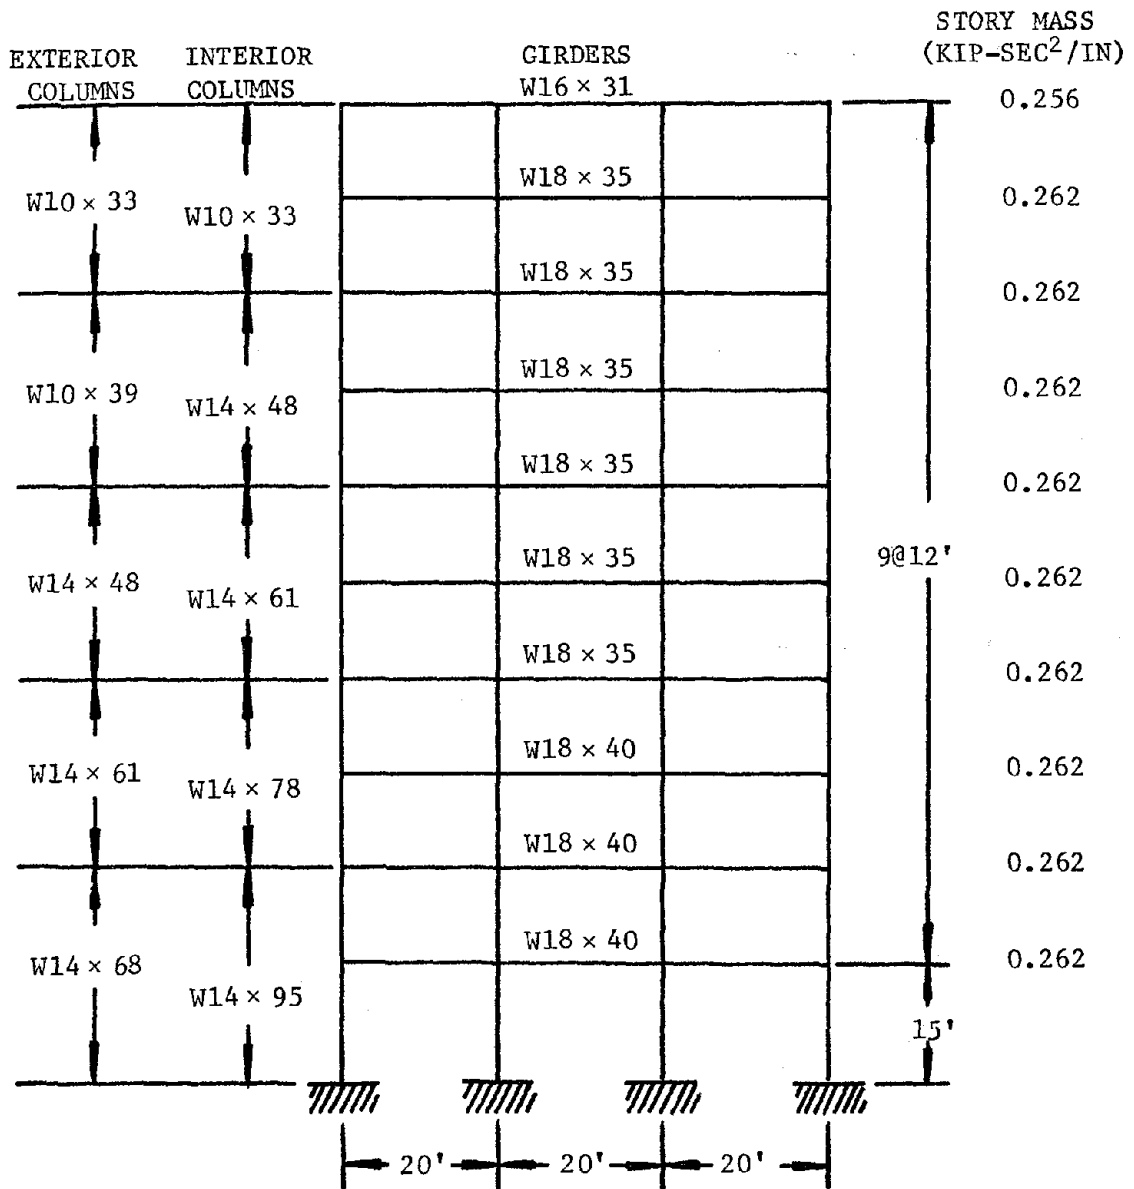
10-STORY STEEL FRAME ELEVATION [PIQUE, 49]
